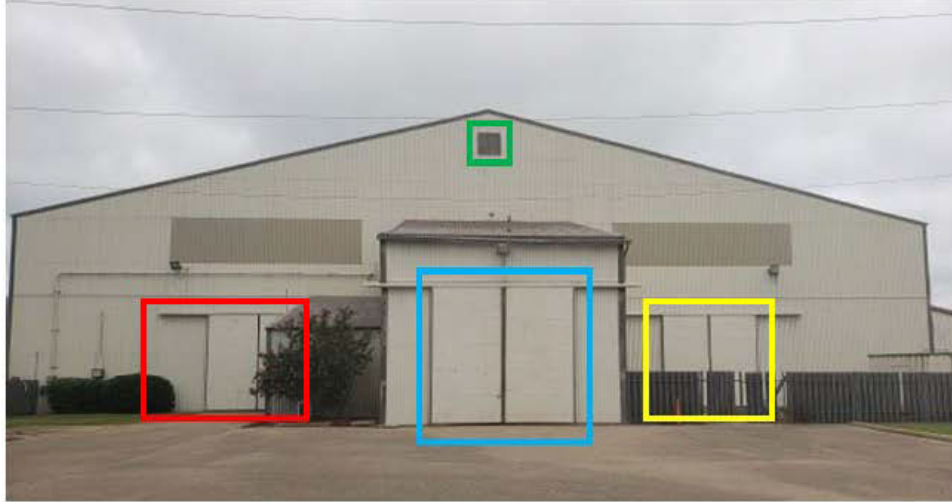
Image showing the current configuration of the southeast elevation. The partially obscured sliding door indicated in red would be replaced with single-leaf and roll-top doors. The sliding door on the nose dock would be replaced with a single and double-leaf steel pedestrian door, indicated in blue. The sliding door indicated in yellow would be removed and covered with siding. Lastly, the vent indicated in green would be removed.
